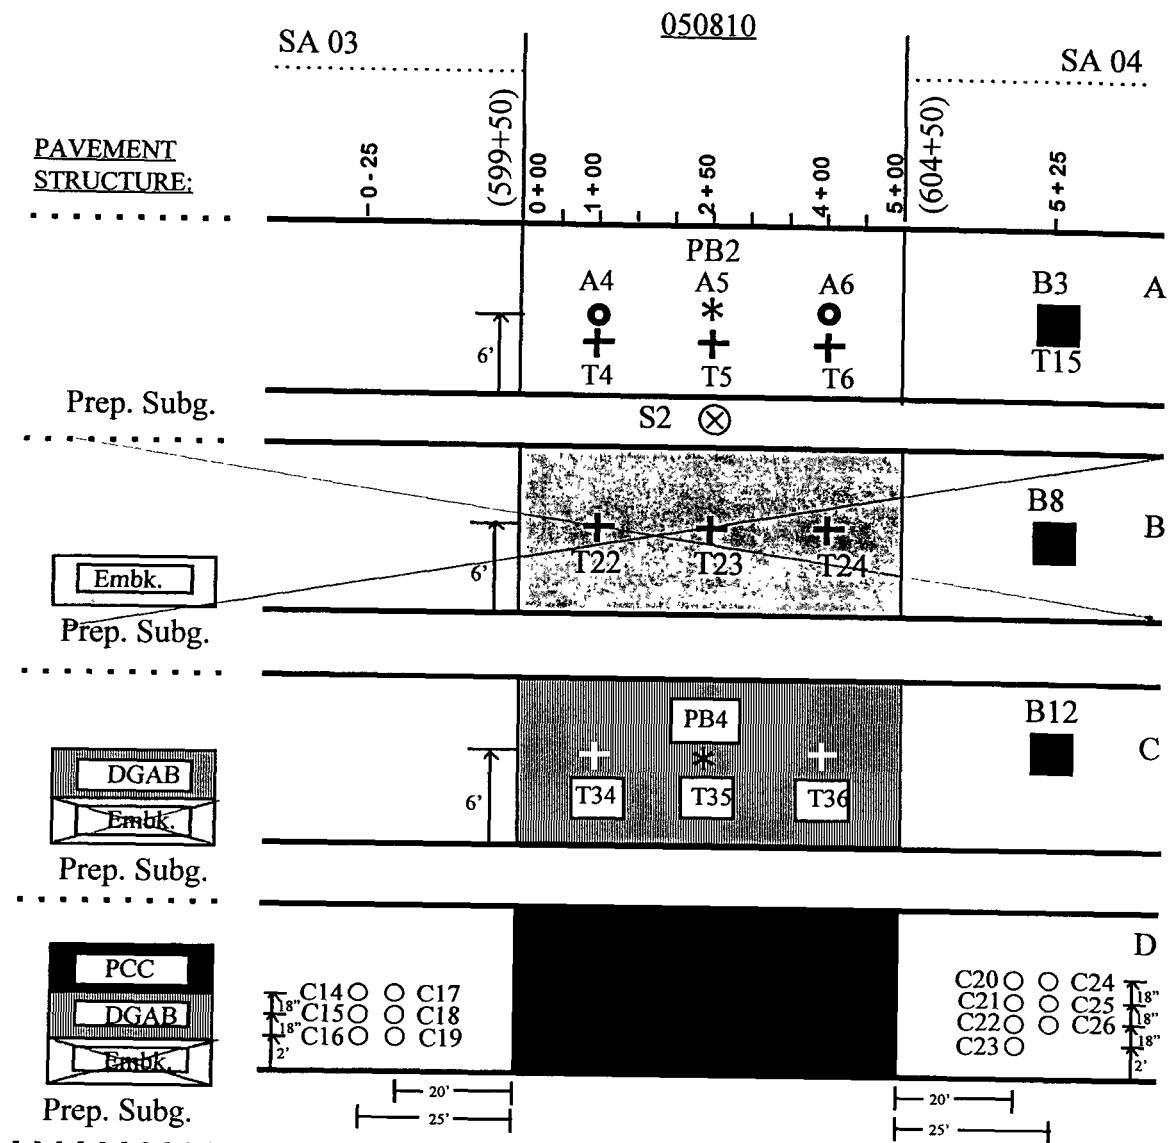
SAMPLING AND TESTING PLAN FOR TEST SECTION 050810
